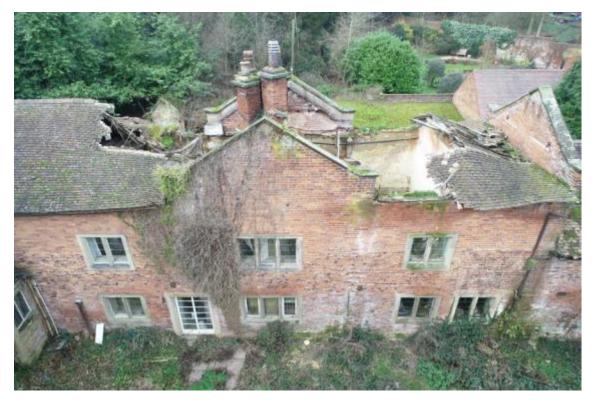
Phase 3 raised roof elements over earlier Phase 2 wing, looking north-west
